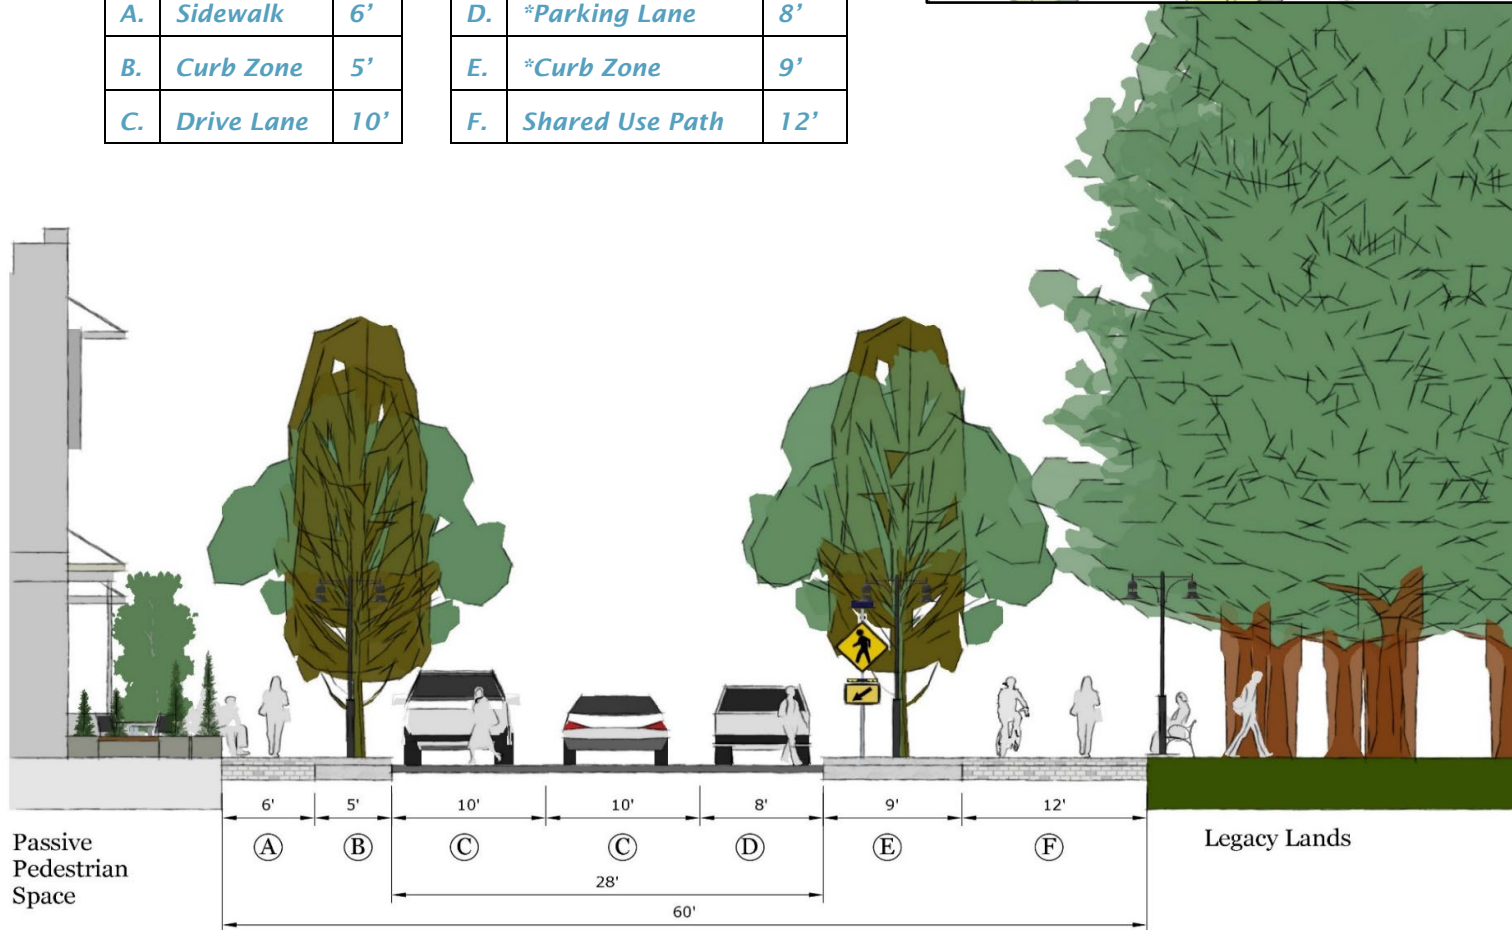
Ridgeline Road Right-of-Way (60' ROW min.)
